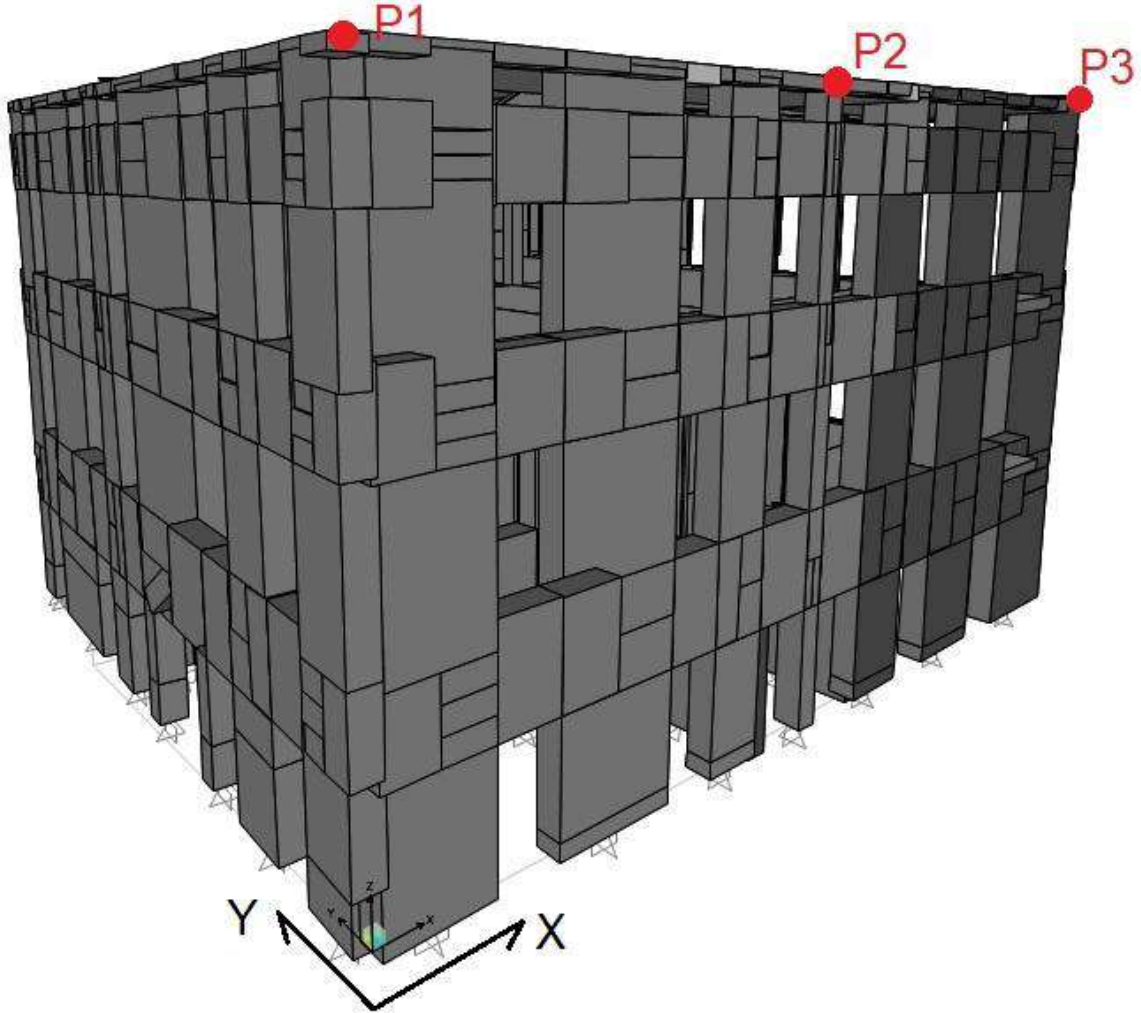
Structural FEM model of the Villa and control points on the top floor (Sap2000).
